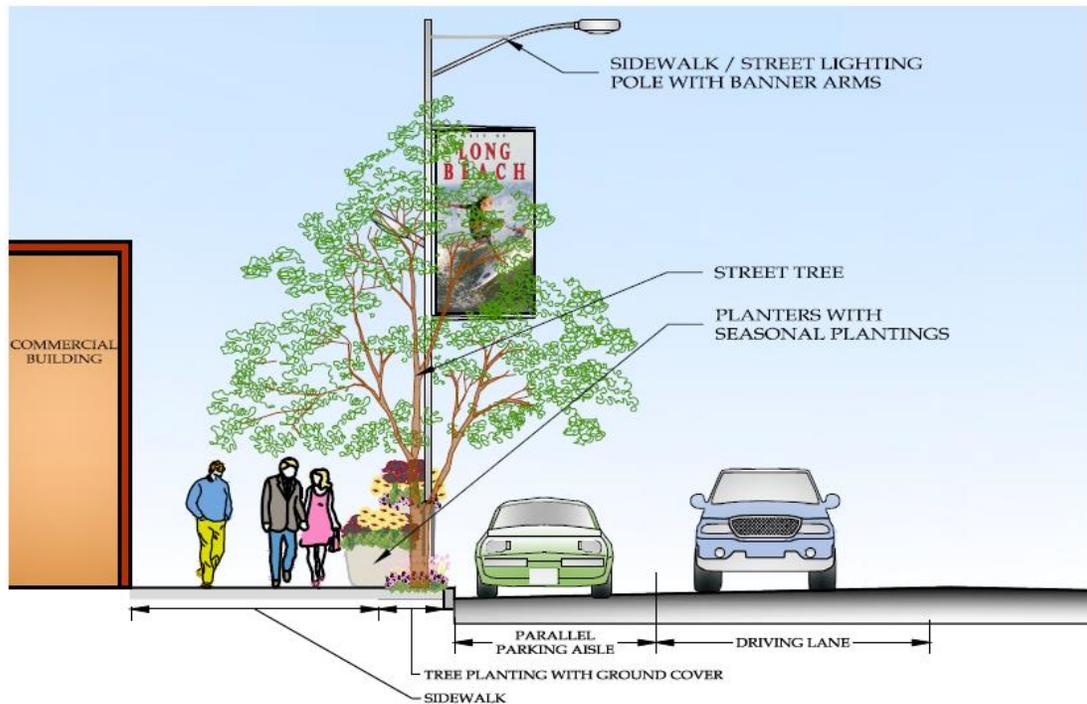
Conceptual Beech Street Enhanced Streetscape Cross-Section
